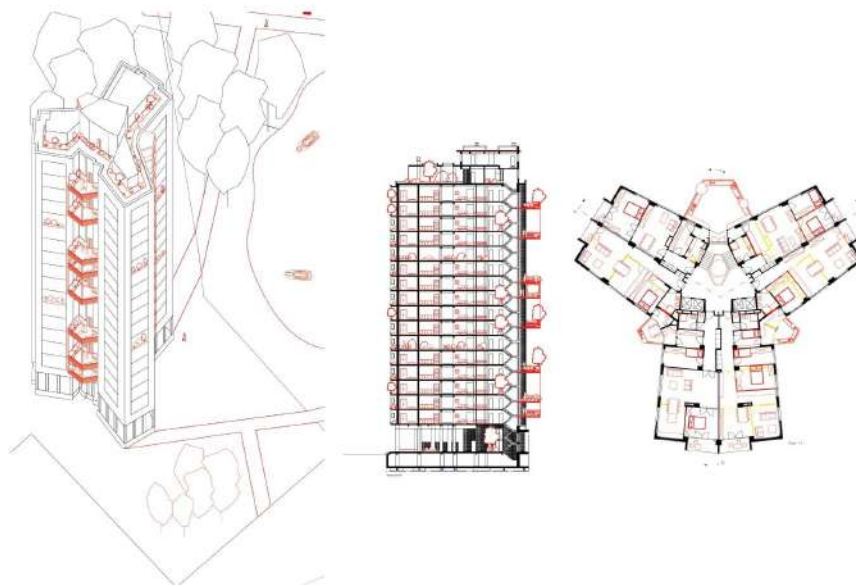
Parasite-strategy in combination with activation of nature: addition of trapezium shaped (green) balconies in the armpits of the towers of the Jan De Voslei in Antwerp; isometric drawing, section and floor plan. Source: Selina Steegen and Kimberly Lievens
